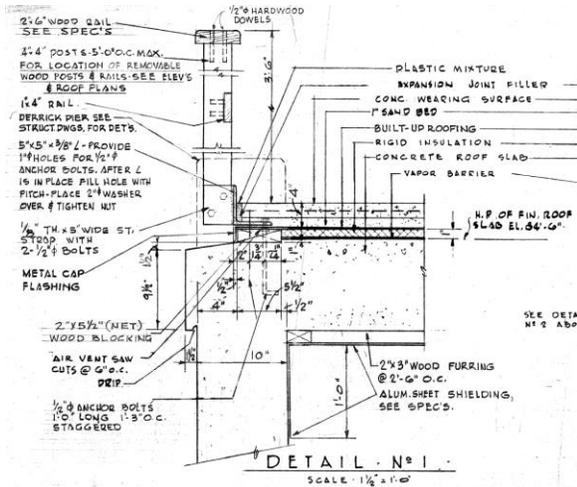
Roof edge detail from original drawings showing the basic configuration of the structural slab, waterproofing, topping slab, and wood guardrail.
